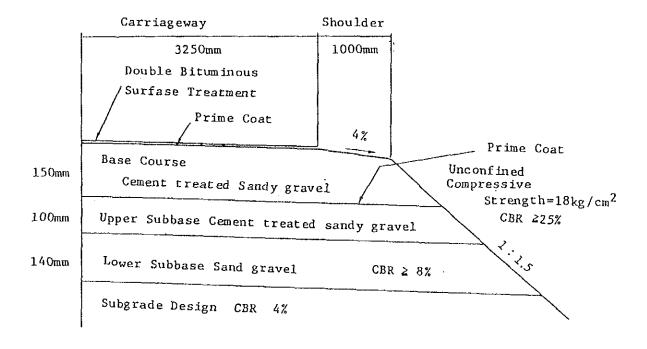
PAVEMENT DESIGN PROPOSED FOR LOT II
